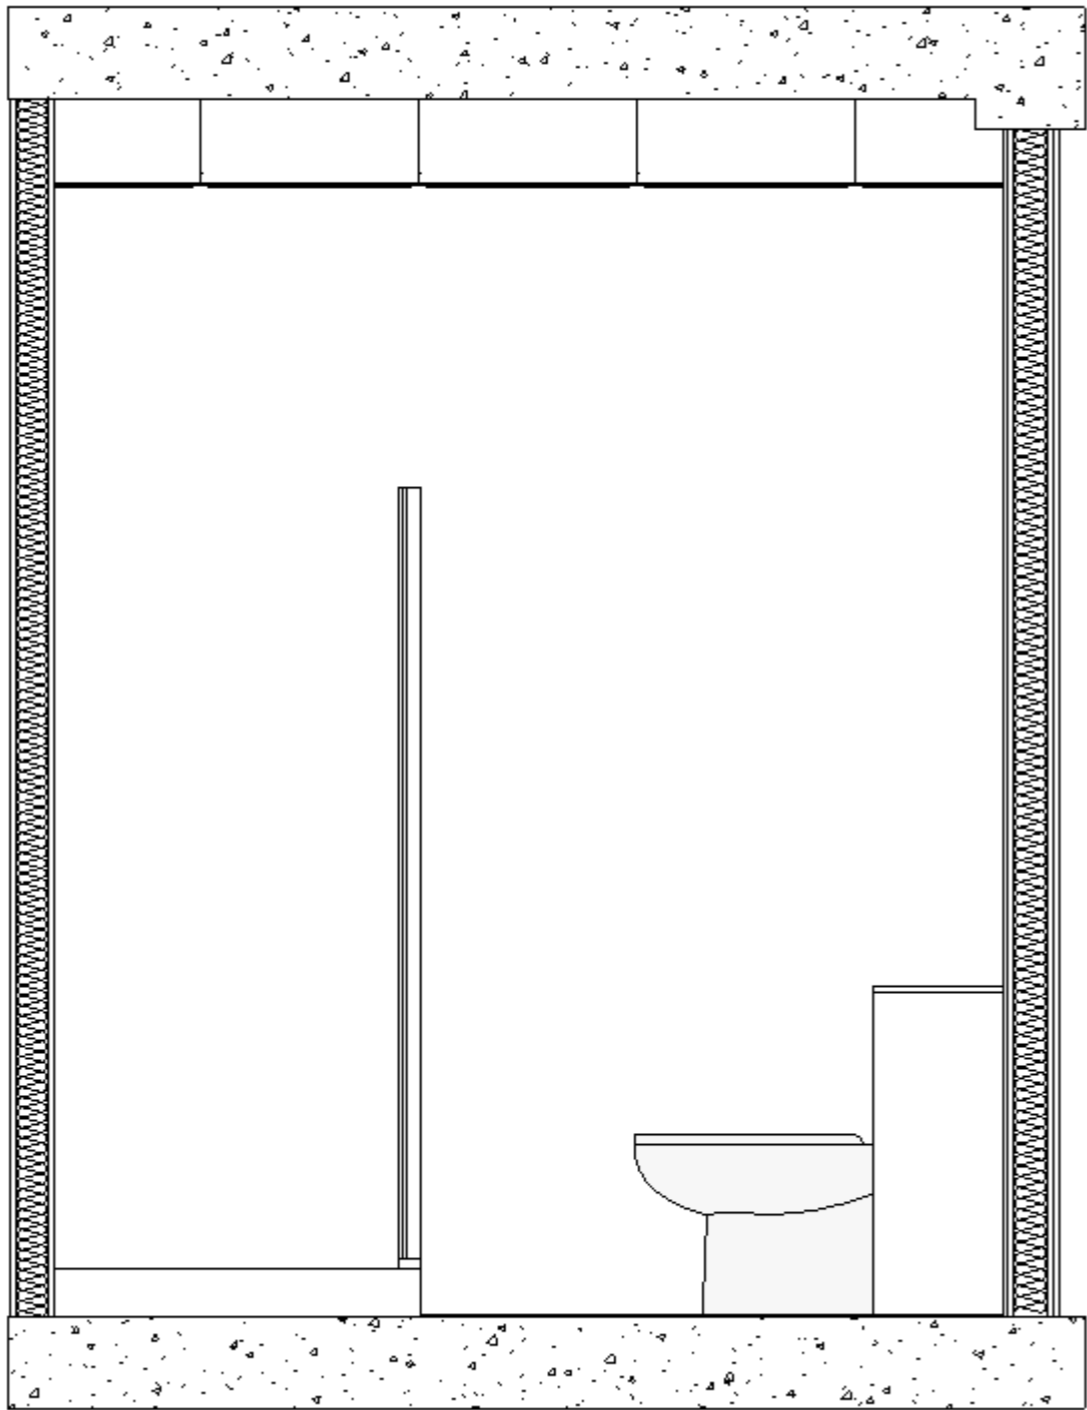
Enlarged Student Bathroom Section (Author, 2021)
